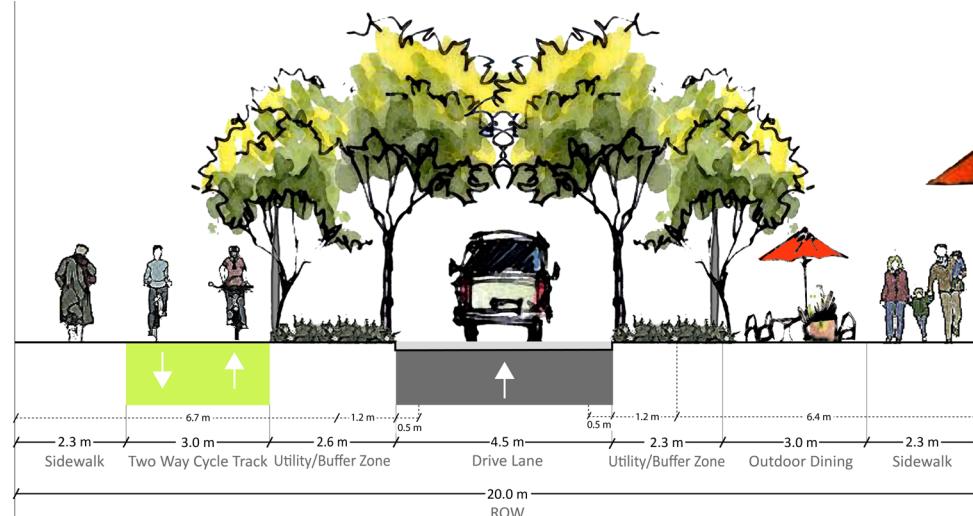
Kapyong Minor Collector Street Type C section with Outdoor Seating
